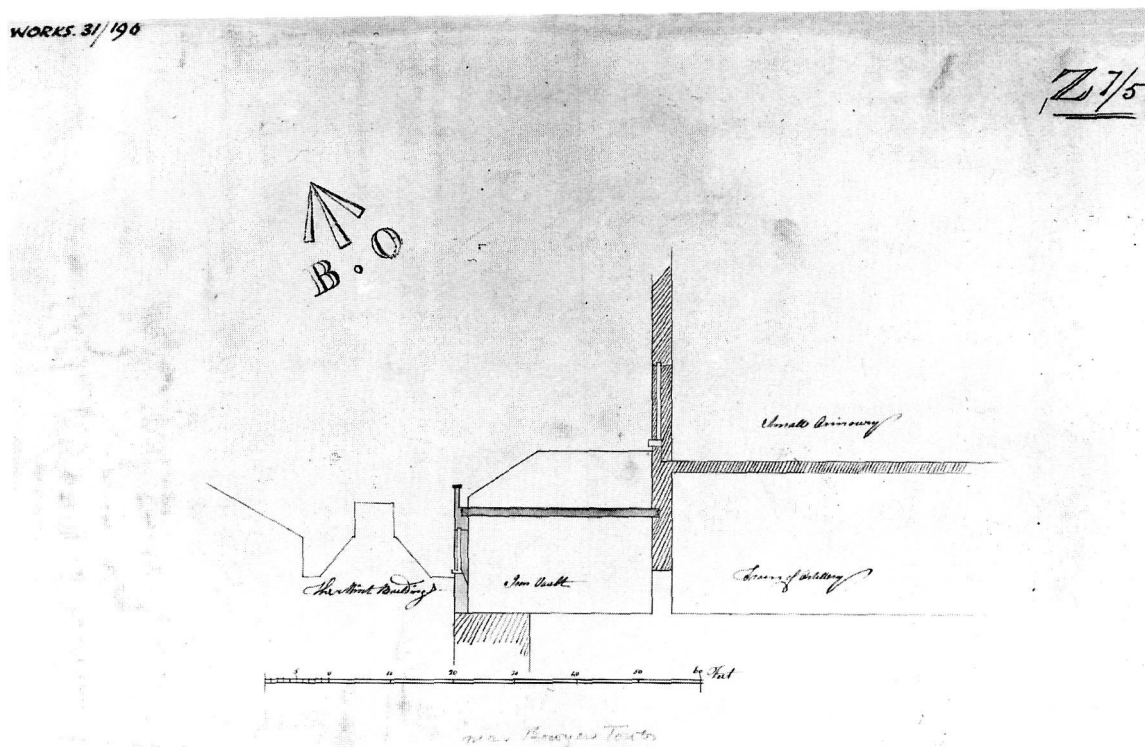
Tower of London: cross-section of the Grand Storehouse and Iron Vault (nd); original in the Public Record Office, PRO Works 31/196
